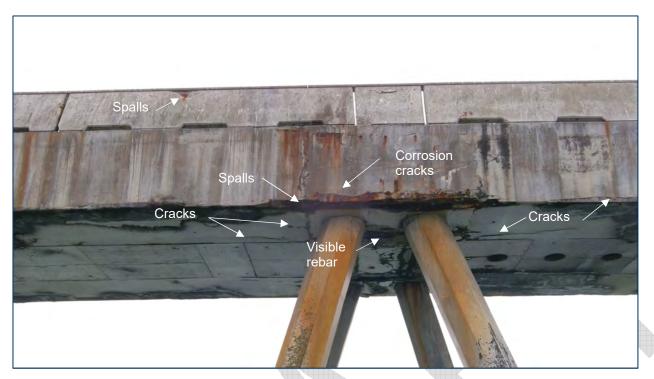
Deck Exterior at Bent 1P - North Face
